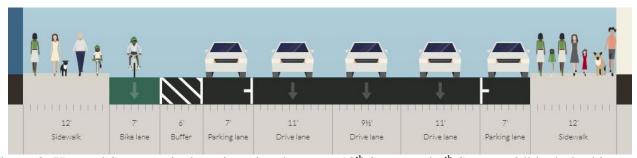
Howard Street typical section view between 10th Street and 6th Street, midblock, looking east
